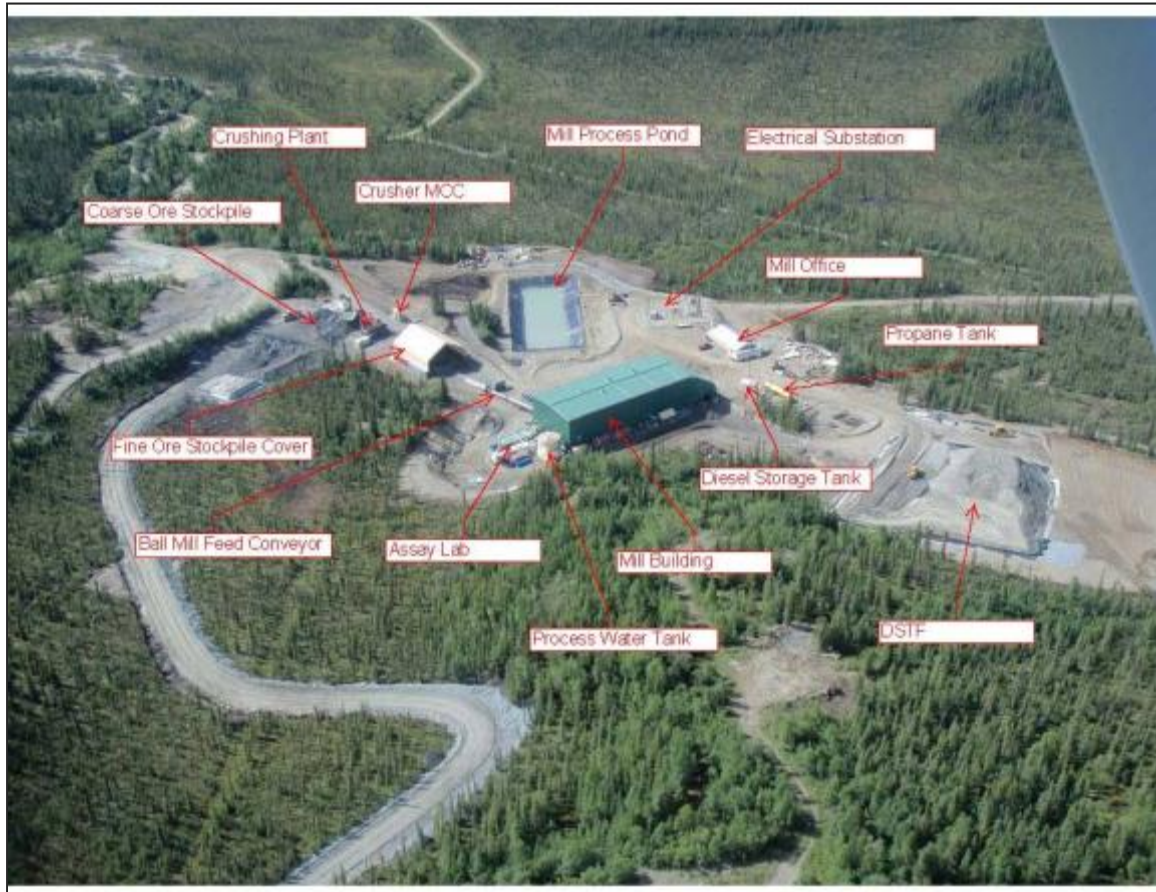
Aerial View of Mill Site Infrastructure and Layout
